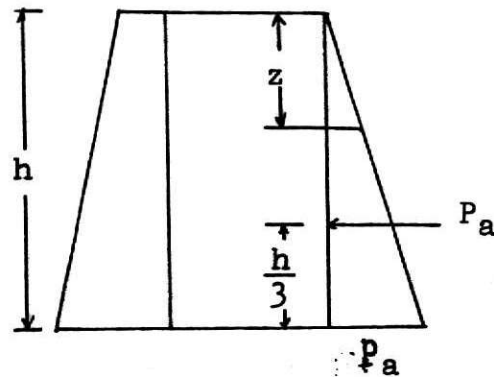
Retaining wall with vertical wall and horizontal backfill
